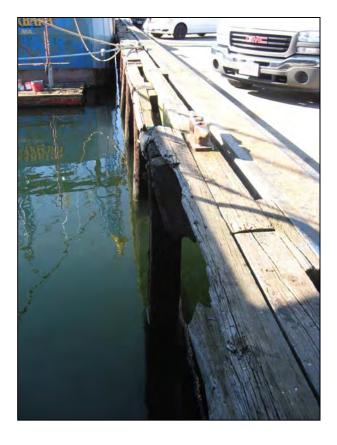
Typical fender section with broken chock and damaged or missing cap board.
